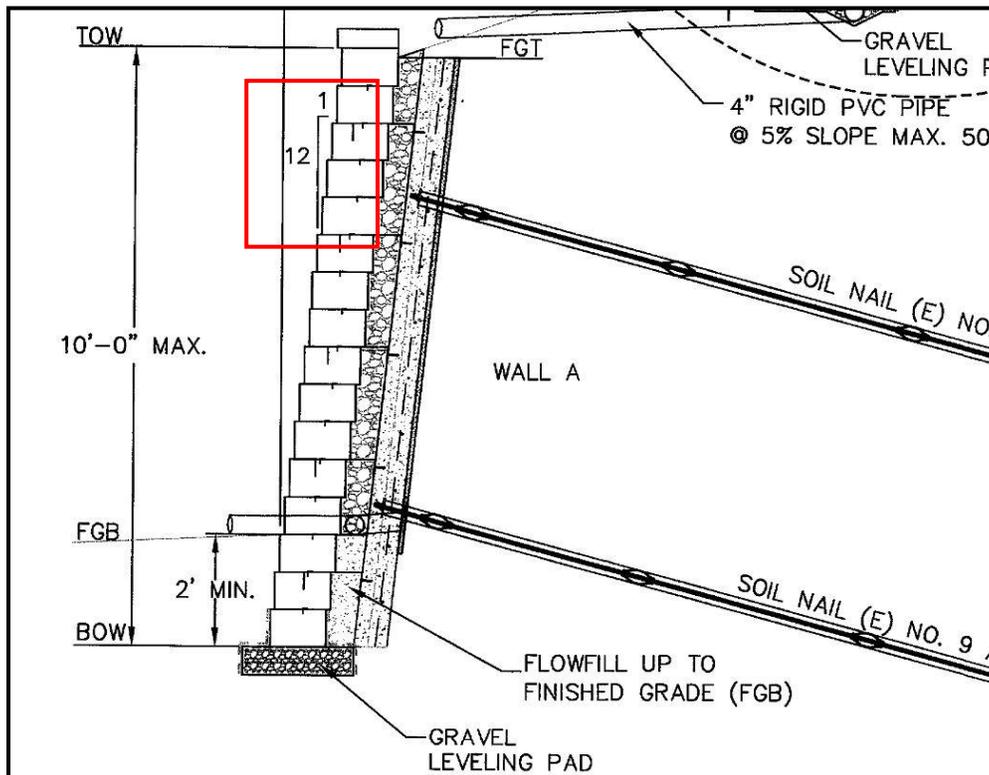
Excerpt from sheet W14-8 from Ground Engineering design drawings showing soil nail wall cross section; notated with red rectangles to highlight areas discussed above
